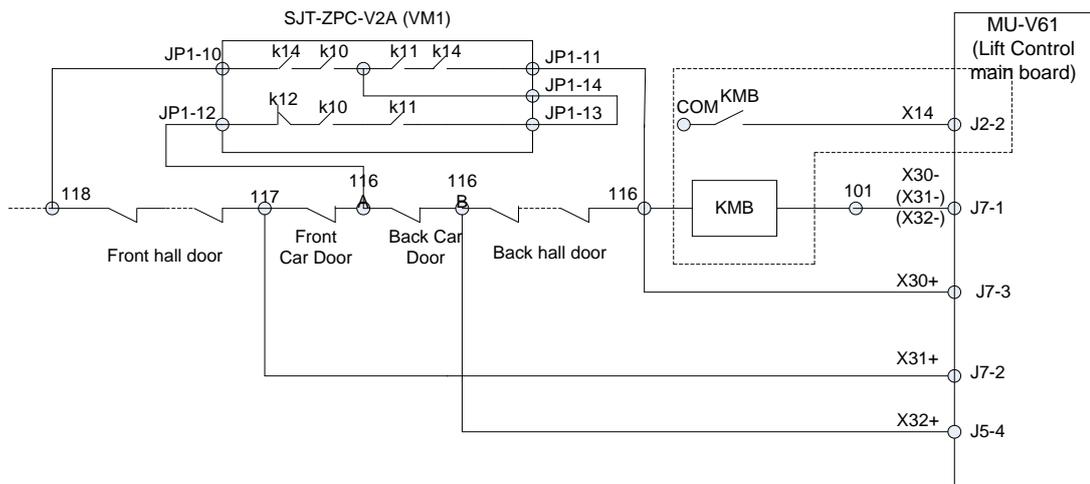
Advance door open & re-leveling & UCMP test & Door short detection control when two door (suit for gearless machine)
